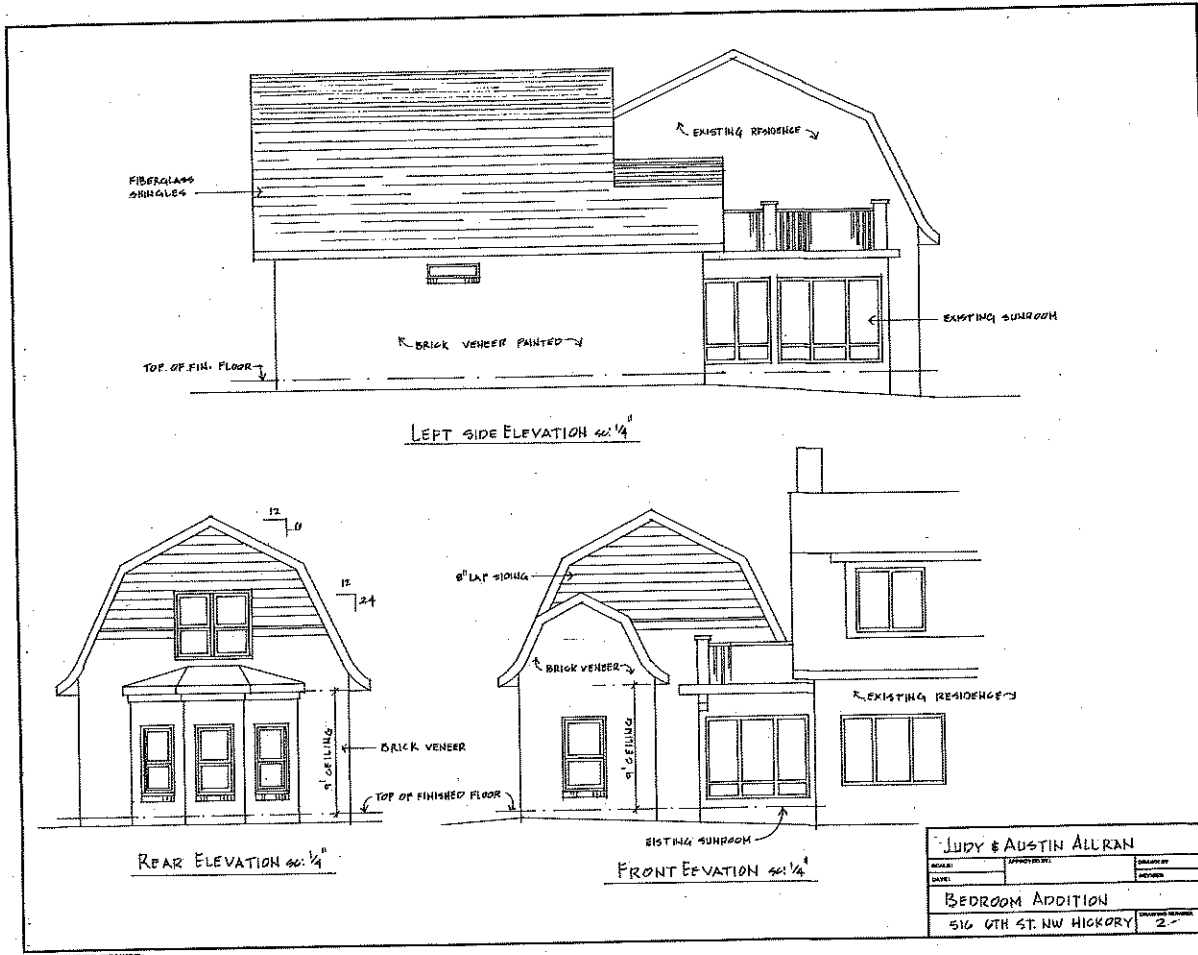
Applicant provided rendering of the proposed side, front, and rear elevation. Note the mansard roof, and windows.
